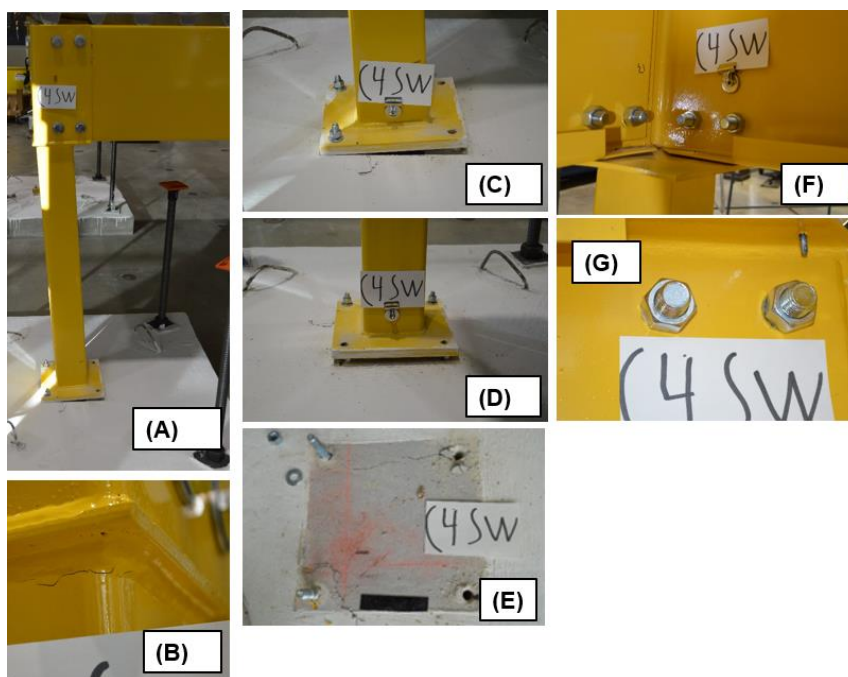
POST-TEST VIEWS OF COLUMN C4SW
